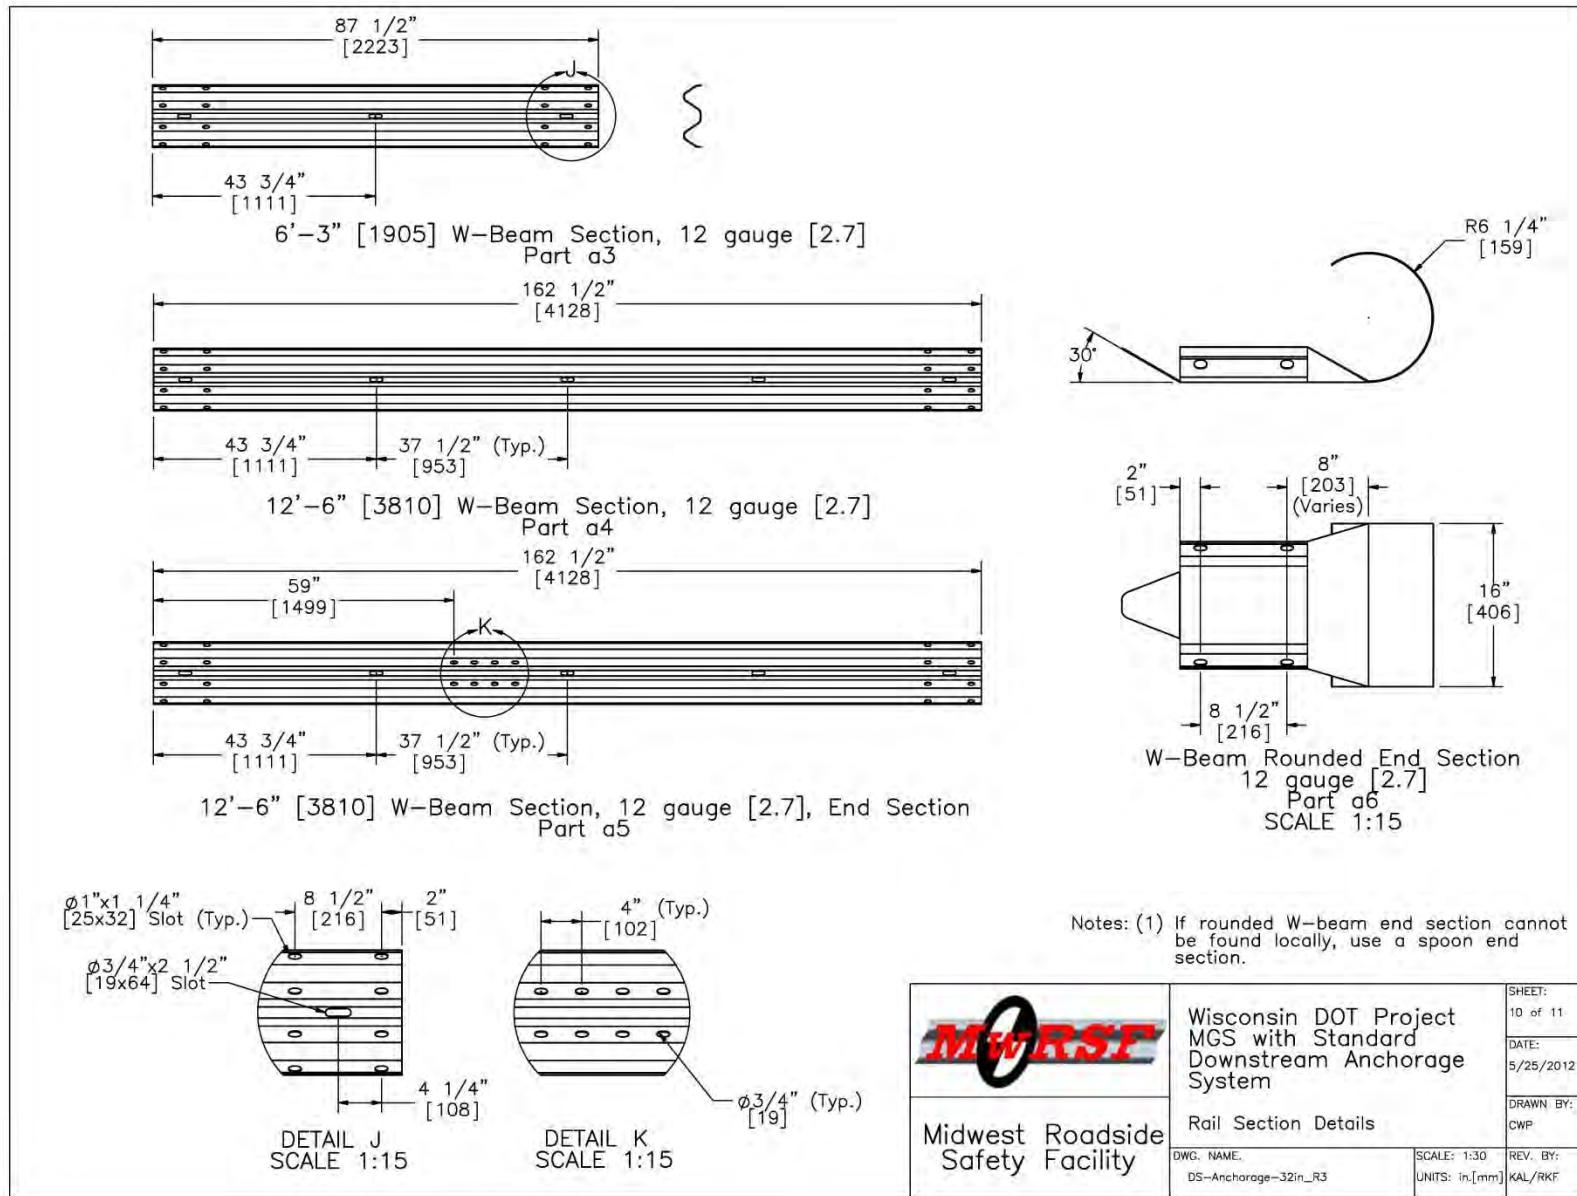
W-Beam Guardrail Details, Test No. WIDA-2
